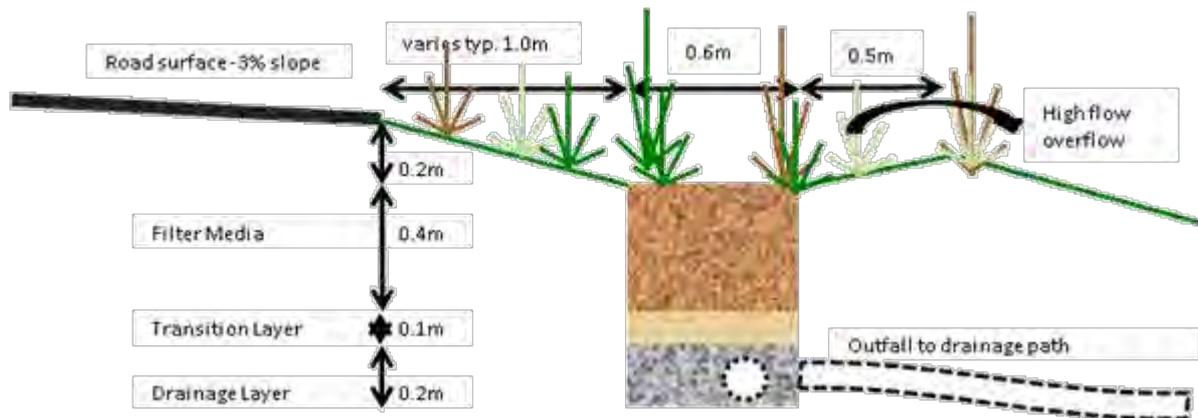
10 Cross section of Bioretention swale, the distance from the road varies.
